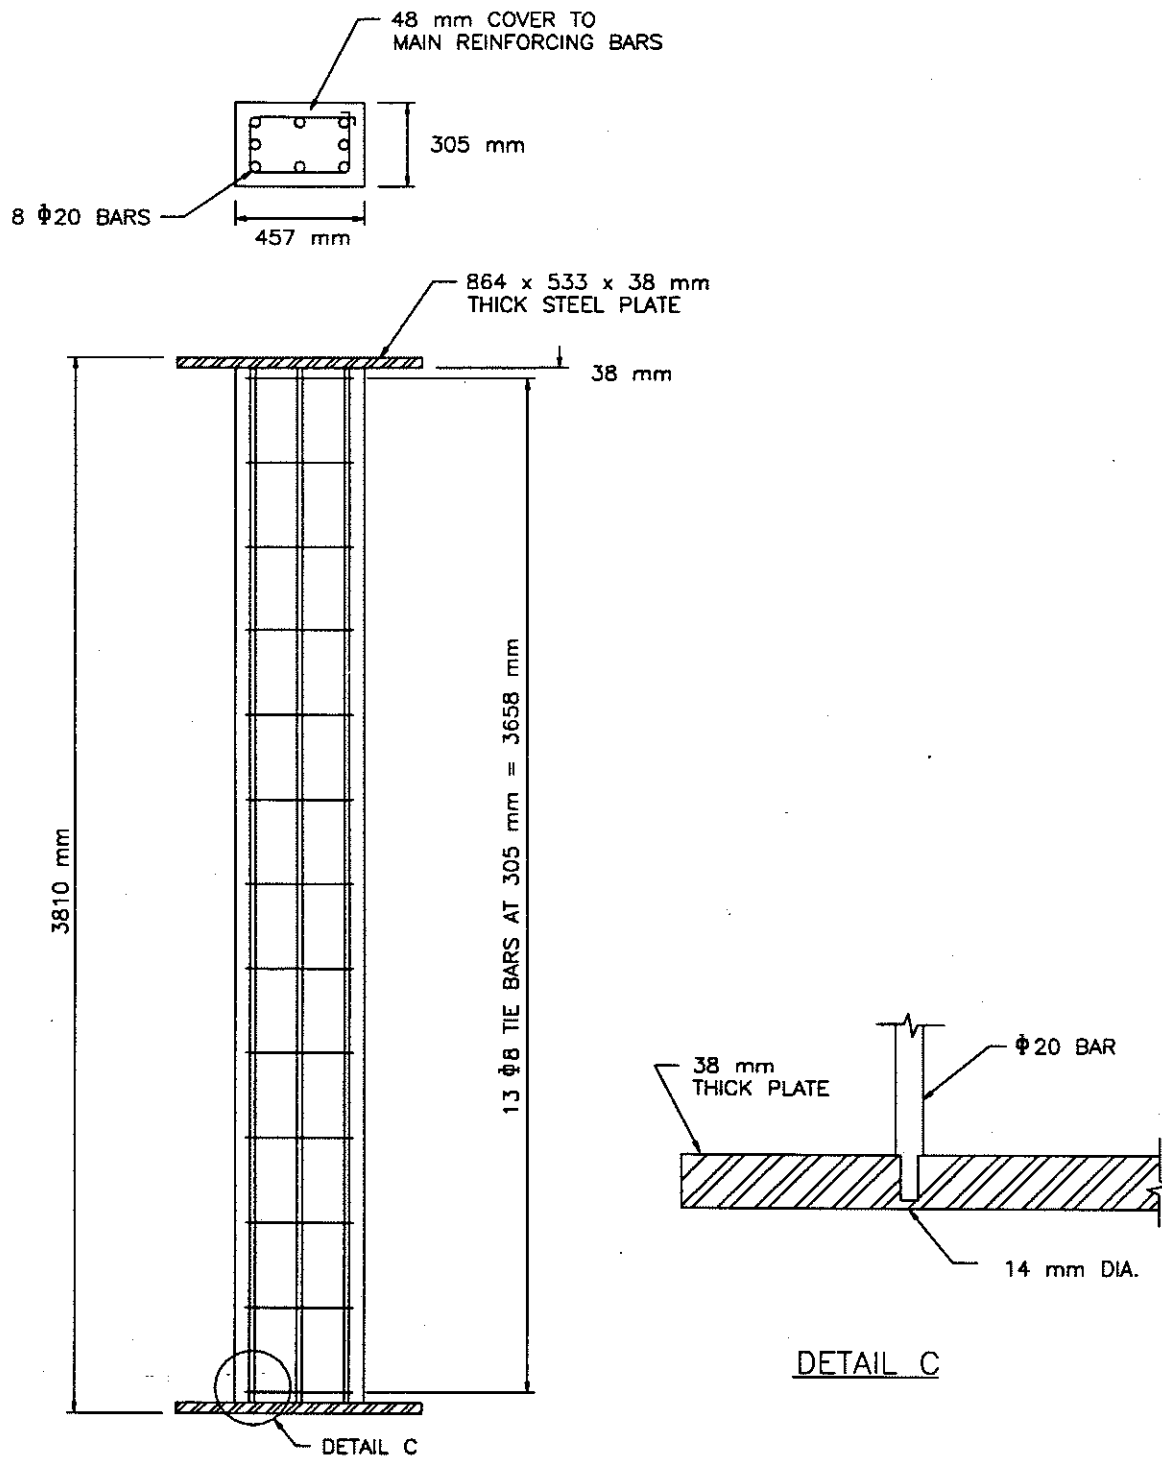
Elevation, Cross-Section and Finishing Detail:
